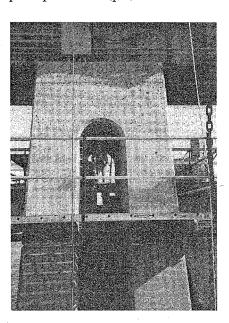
Downstream face of pier 42 with injection ports being located and installed. A total of 1,052 injection ports were used in Pier 42.
